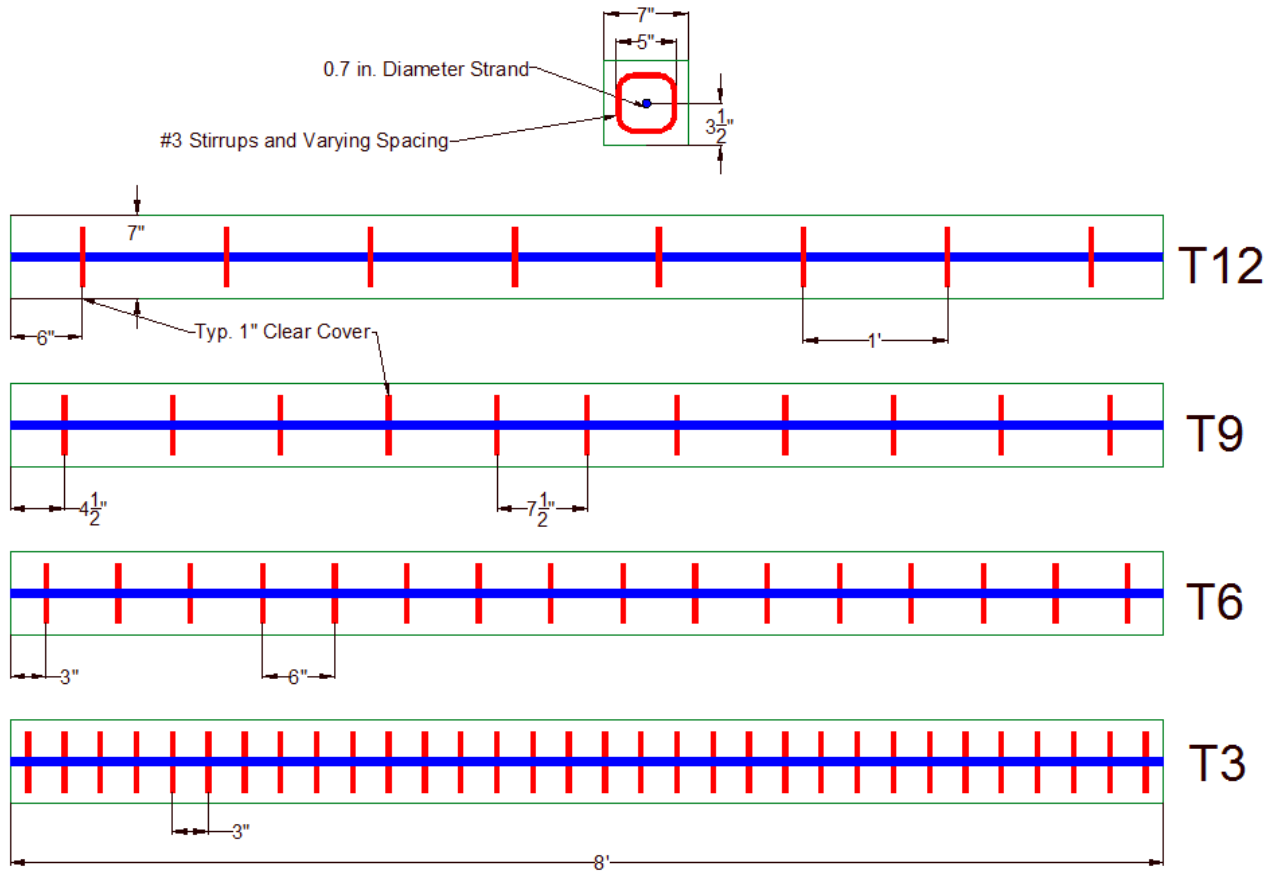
Transfer prism reinforcement with specimen nomenclature
